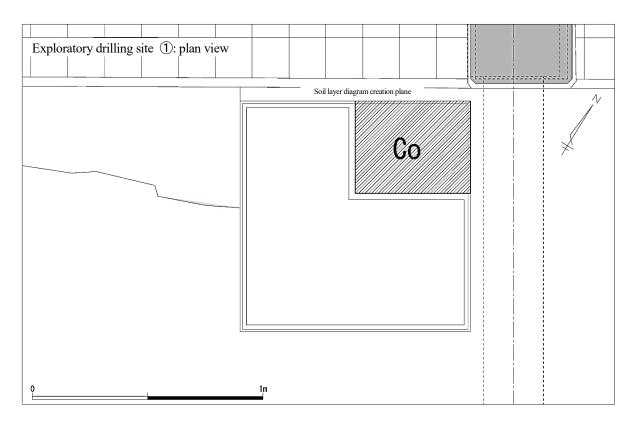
Exploratory Drilling Site ①, plan view
